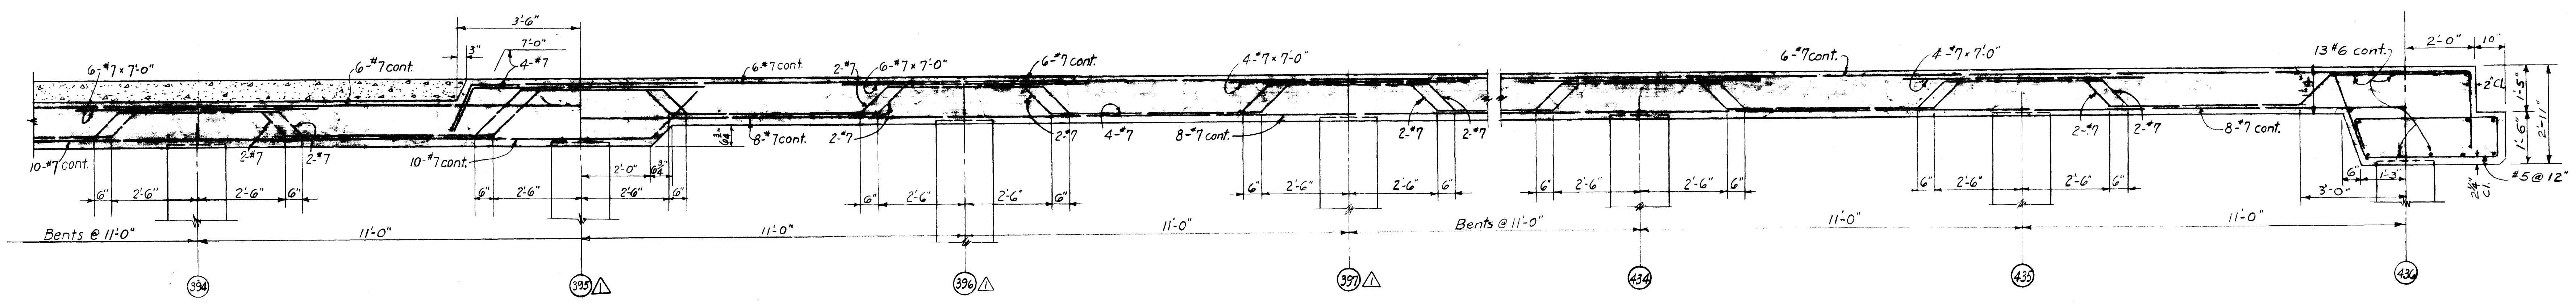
DETAIL OF BEAMS ALONG LINES F & G EAST DECK, Continued
